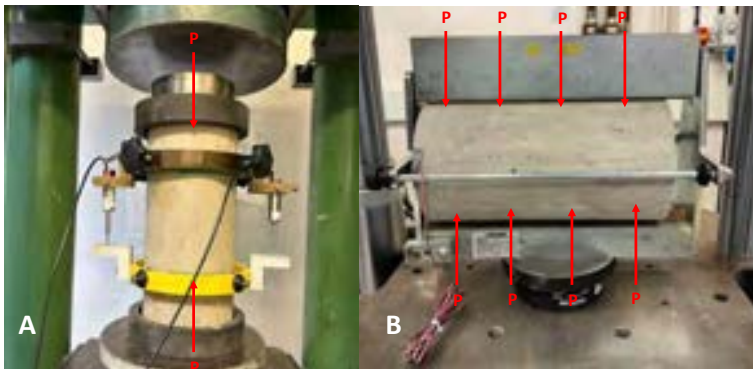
A) compressive test (ASTM C39) . B) split tensile test (ASTM C496).
